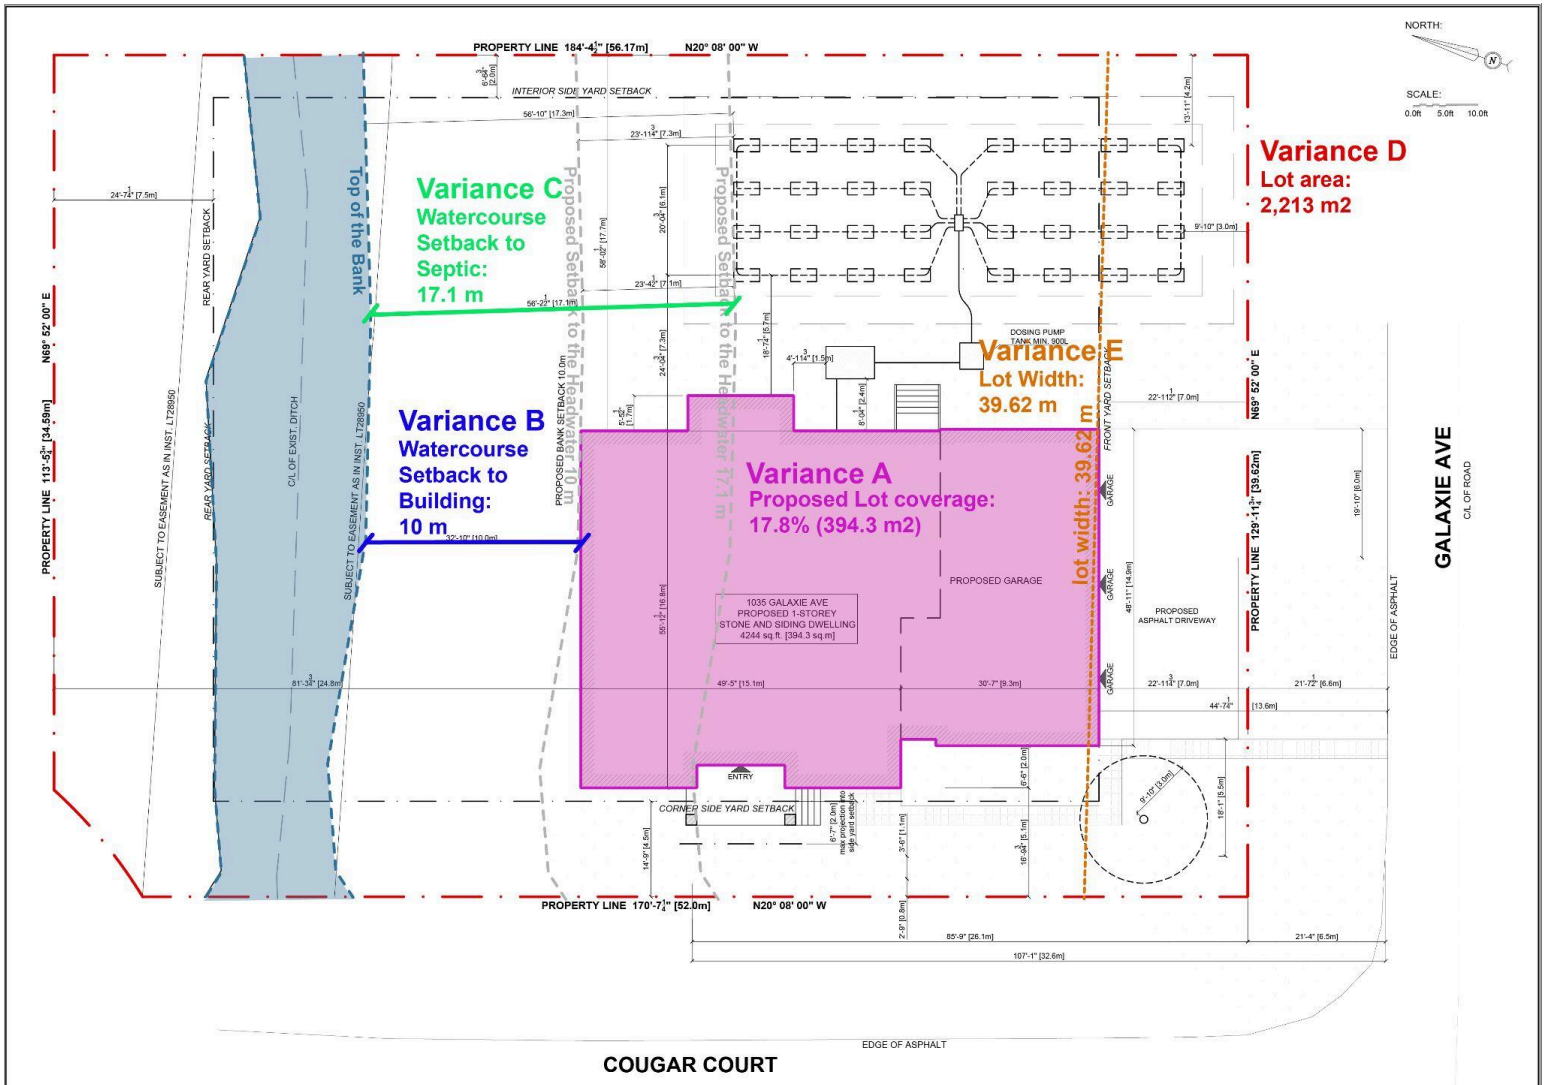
Site Plan by CARBON Drafting & Design showing the property boundary, the proposed building footprint, the drainage ditch (top of bank) and the location of Minor Variances (A, B, C, D, and E).
